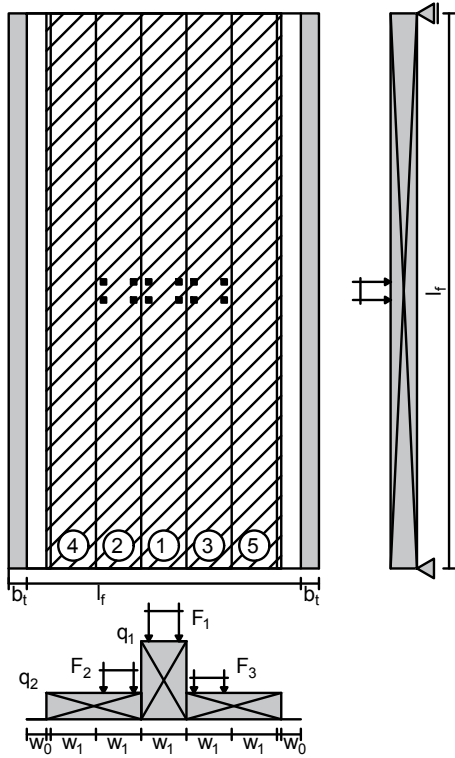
Load situation 1 - traffic load configuration for maximum loads in the floor girder at midspan
